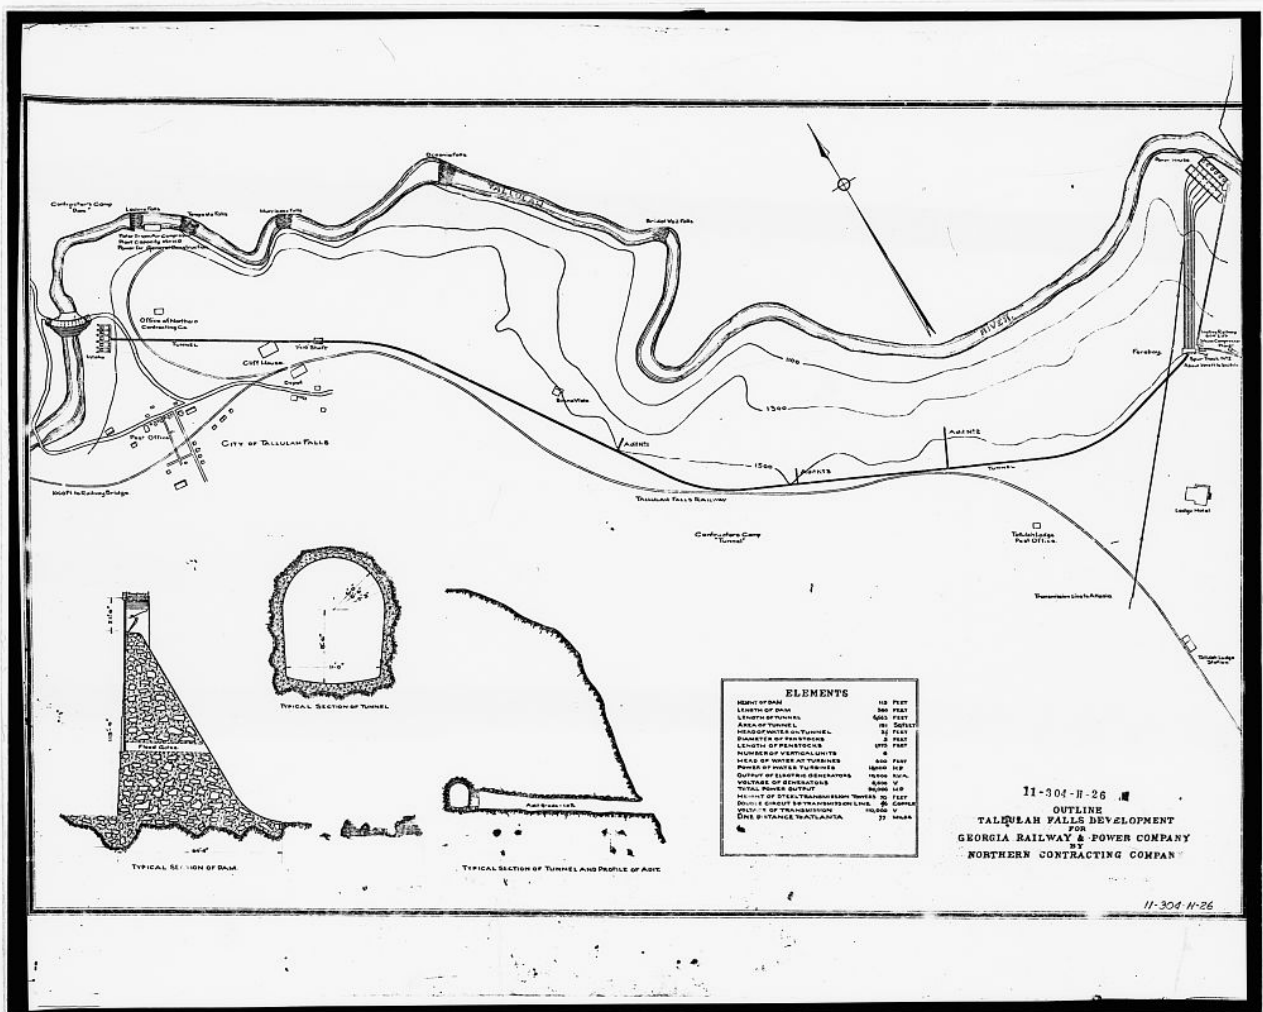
Plan view of Tallulah Dam, tunnel, penstocks, and generating building.
